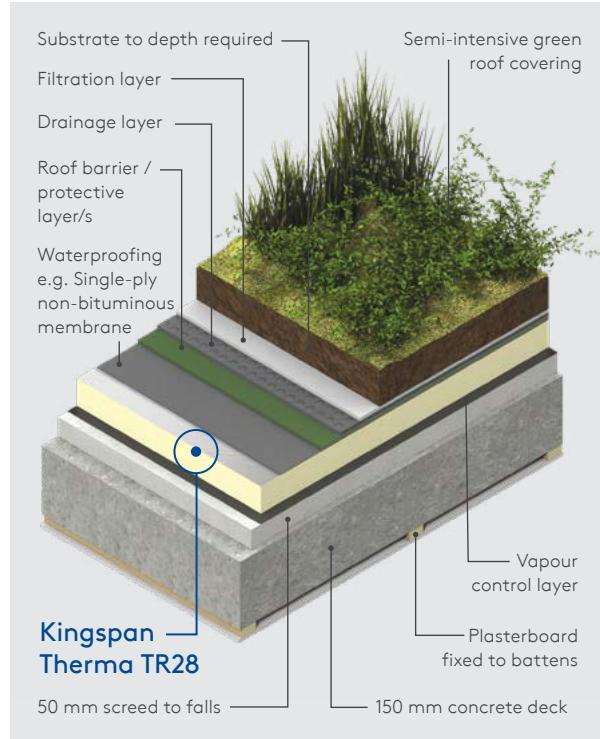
Semi-Intensive Green Roof Covering – Dense Concrete Deck with Suspended Ceiling
